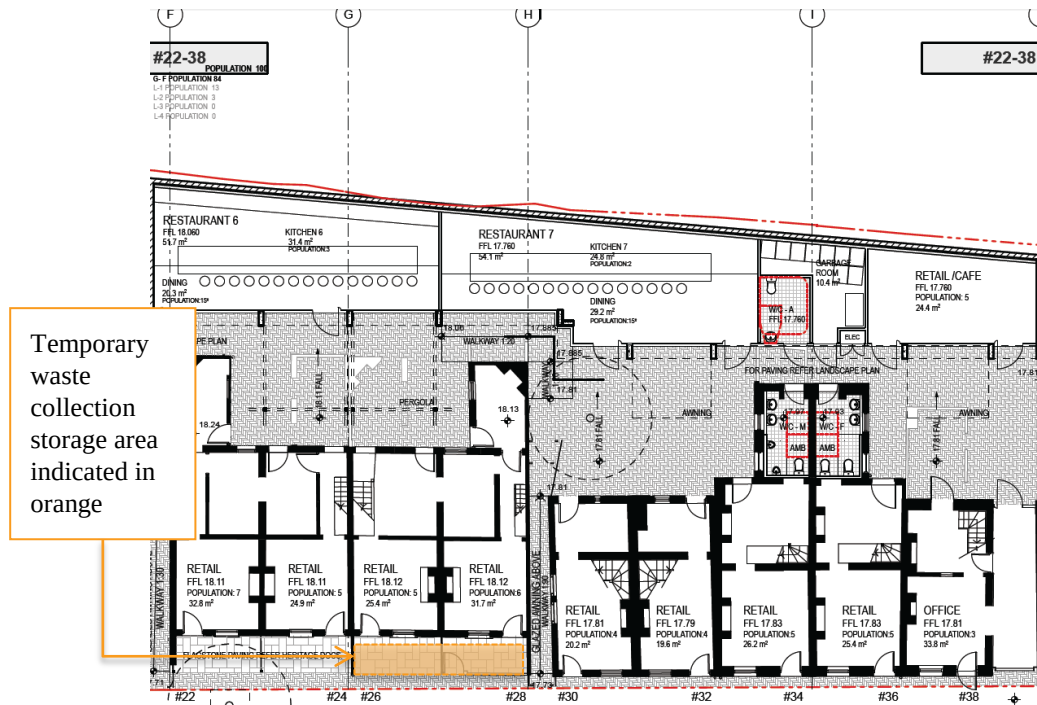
Temporary waste bin storage area for collection, building section #22-38
